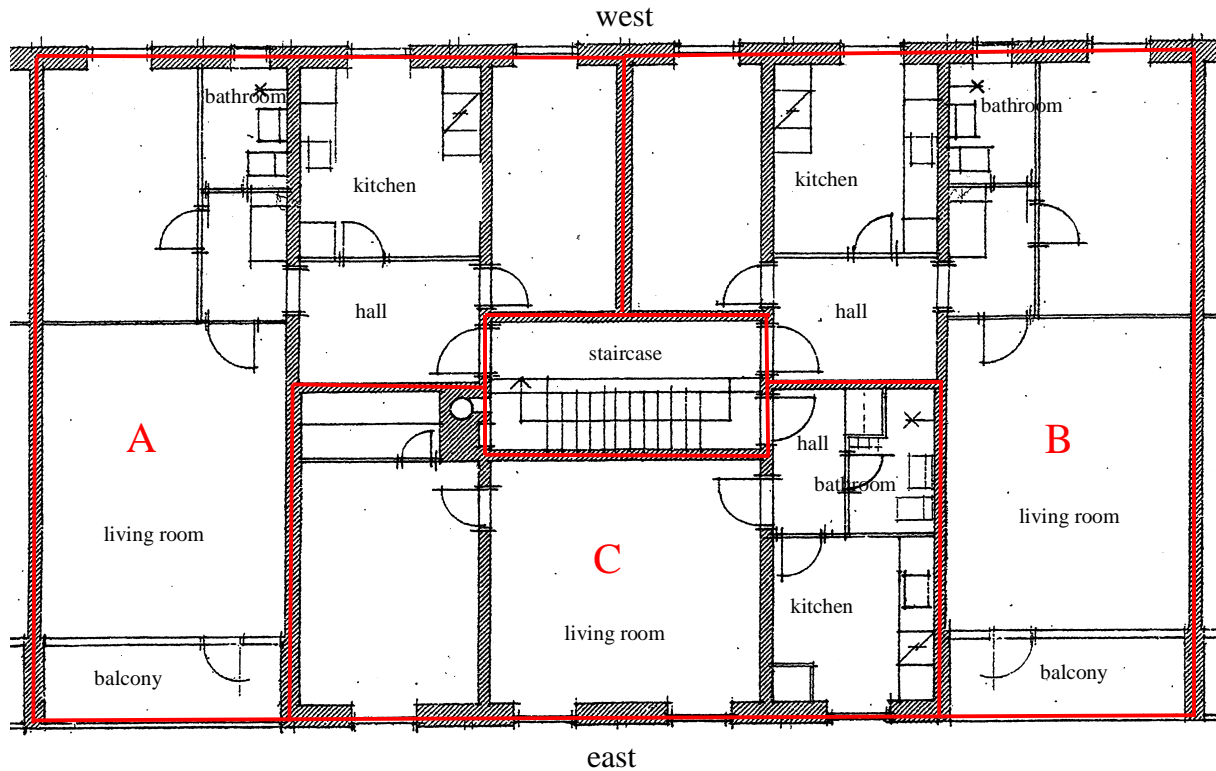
Plan of one floor of one of the staircases in Lundebjerg 36-40
